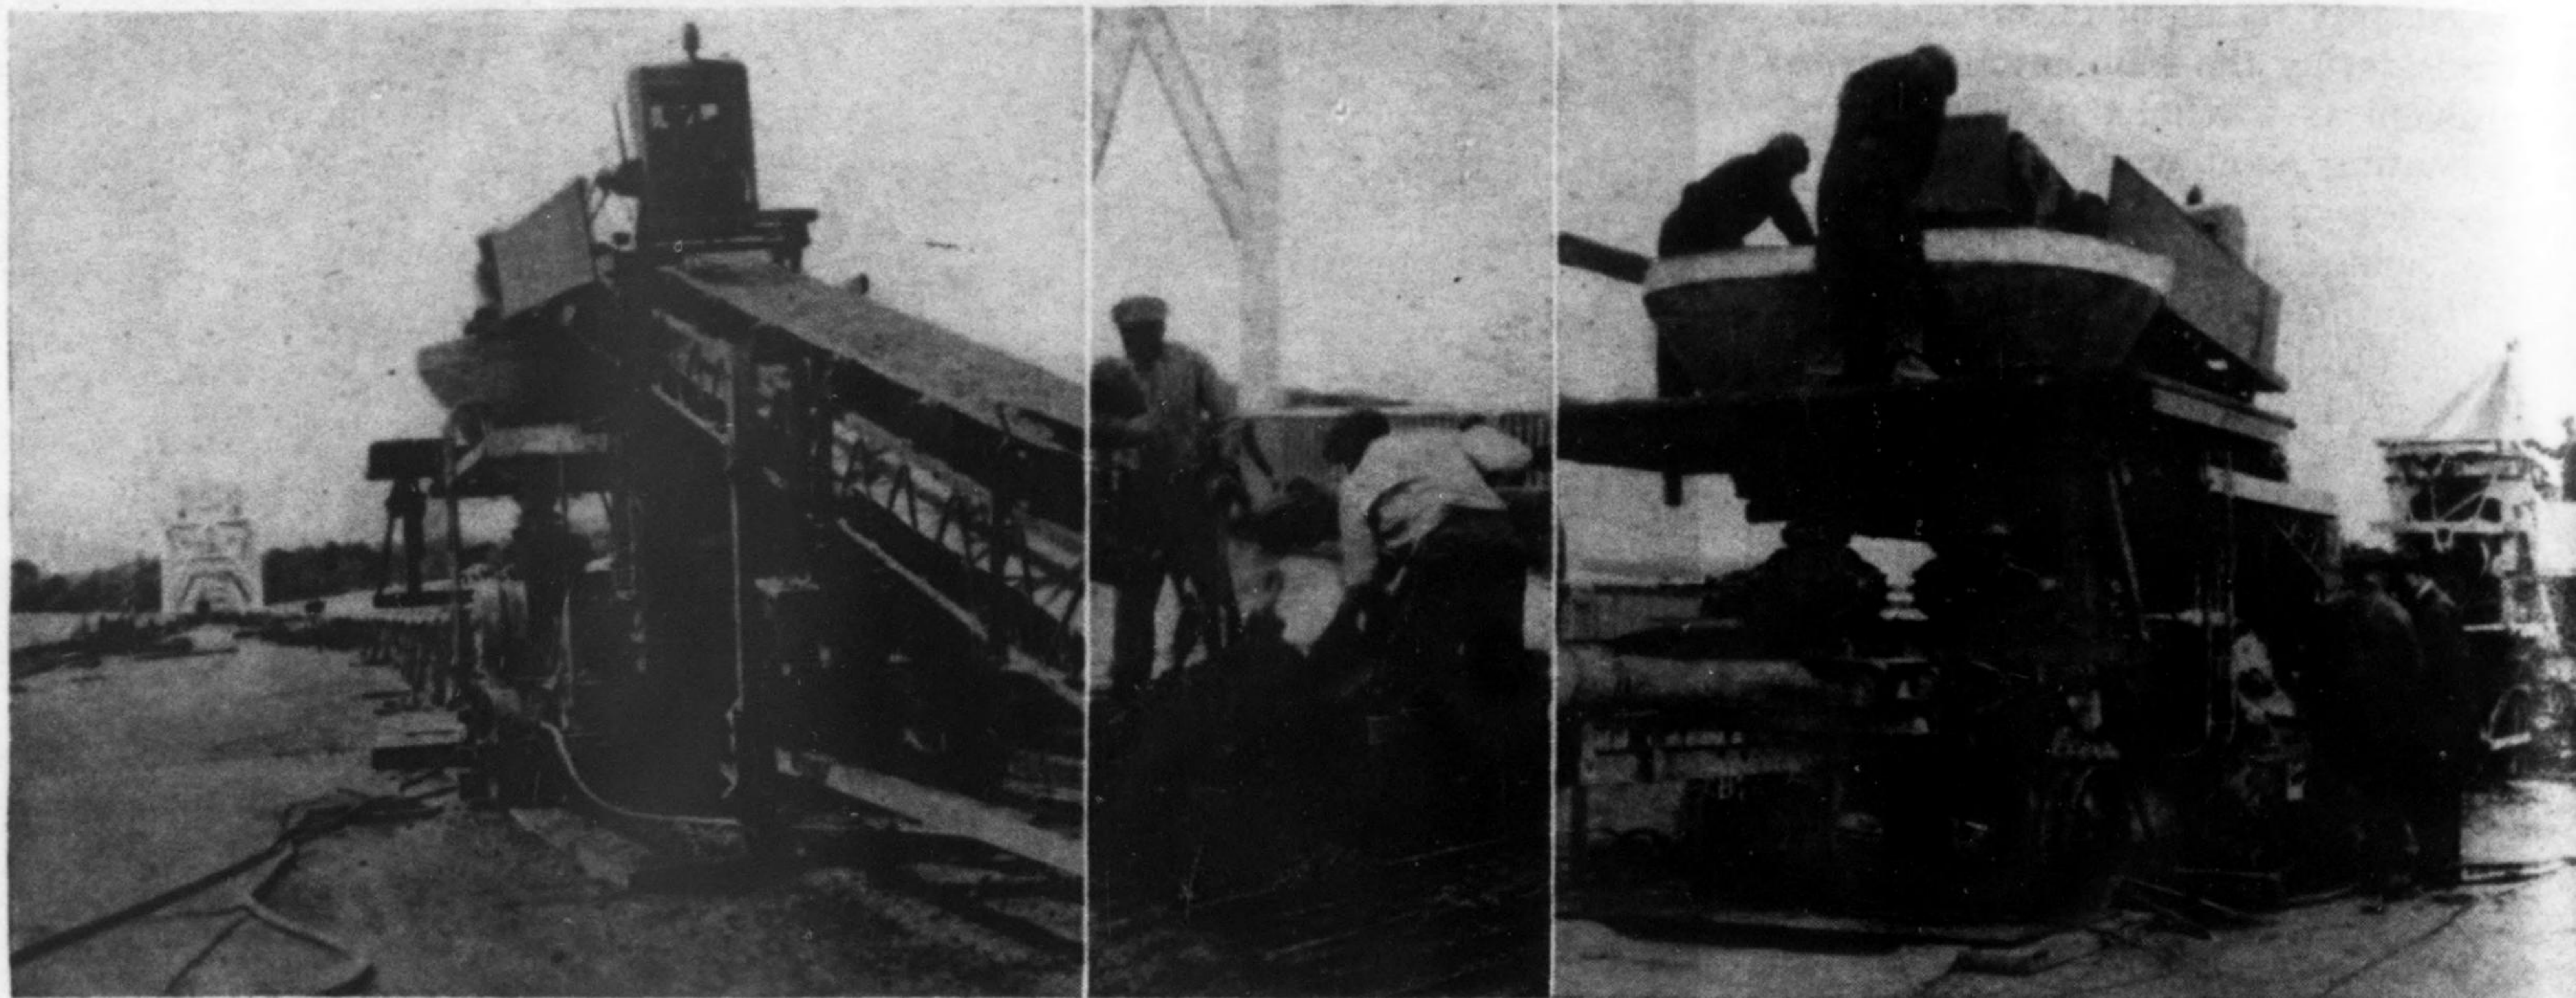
DECK CONCRETING was carried out by an equipment combination consisting of paver, belt conveyor and 7-in. duplex concrete pump, located some 1,200 ft. behind the point of pour on slab that had cured seven days. Concrete of a slump of 1 to 2 in., as delivered to the pipe line, was spread on the deck with the aid of an electric tamping screed.
